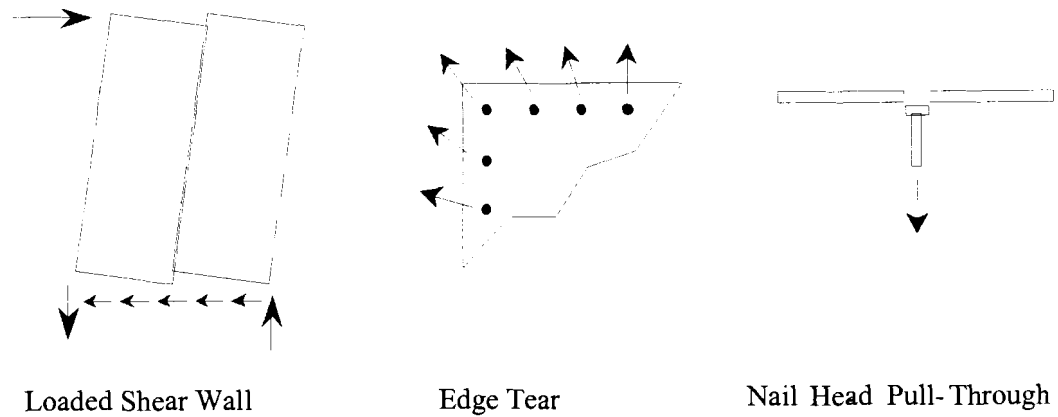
Deformed Shear Wall and Critical Failure Modes.
